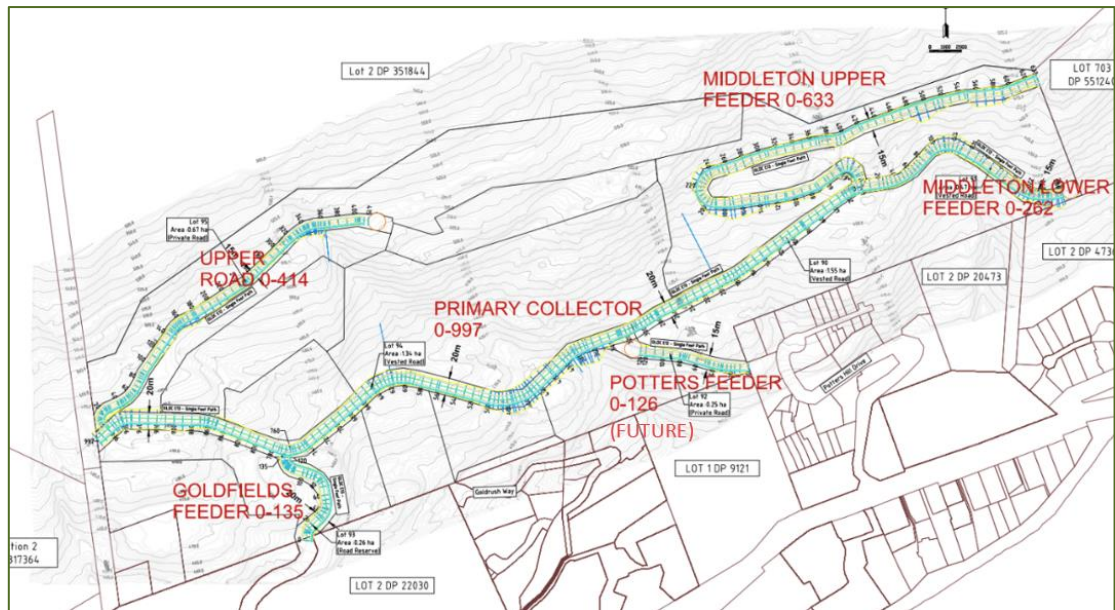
Post-development Roding Plan (Source: Silver Creek Residential Development plans)
